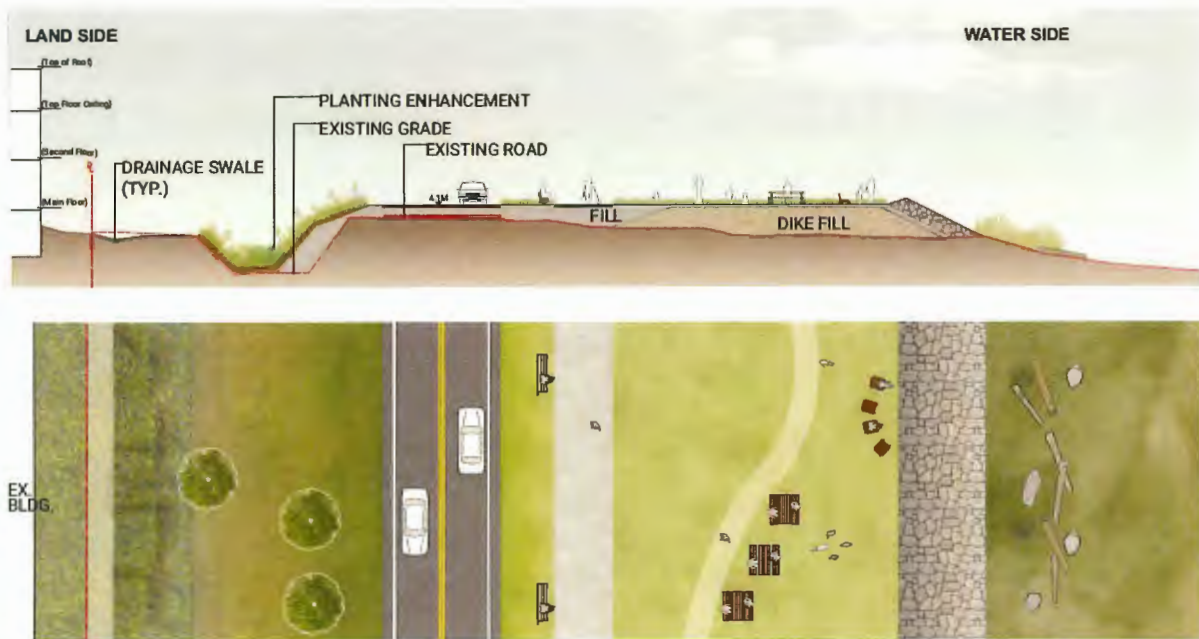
Section A – Section and Plan View of the Preliminary Dike Design near the London Landing Wharf and Riverfront Park
